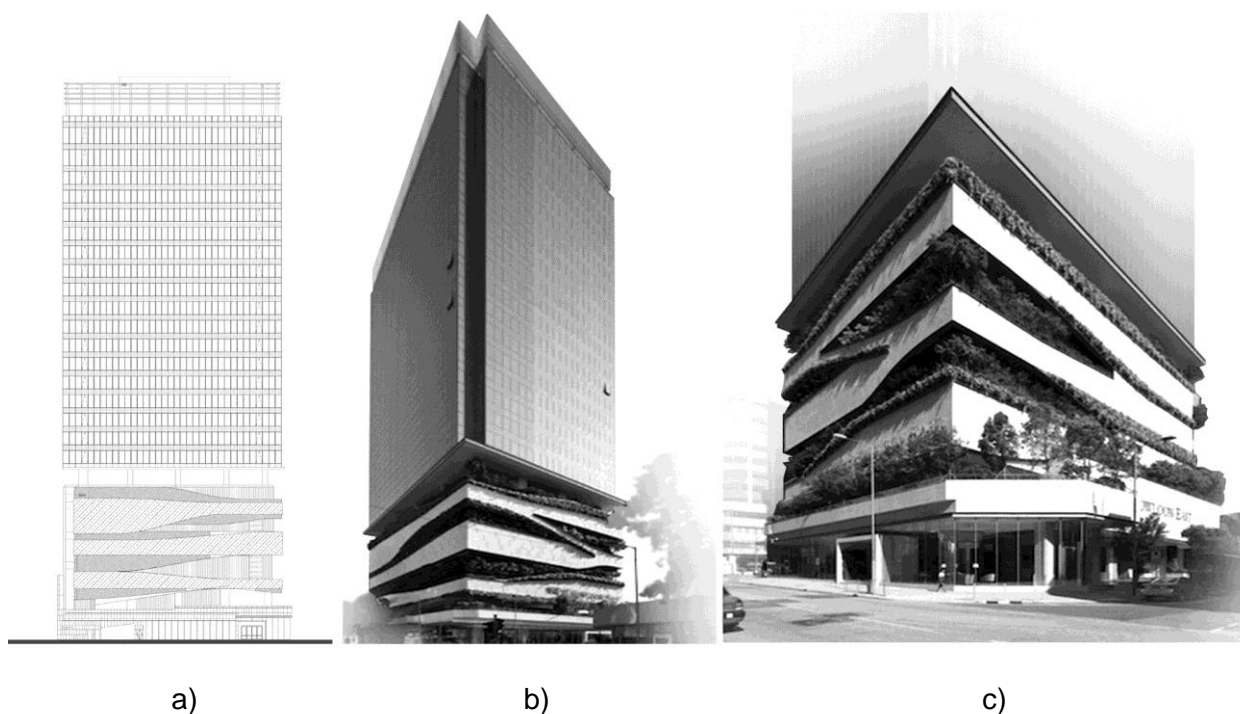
(a-c). 18 Kowloon East multi-storey parking garage, Aedas, Kowloon Bay, Hong Kong, 2010: a) main facade; b) general view; c) detail
